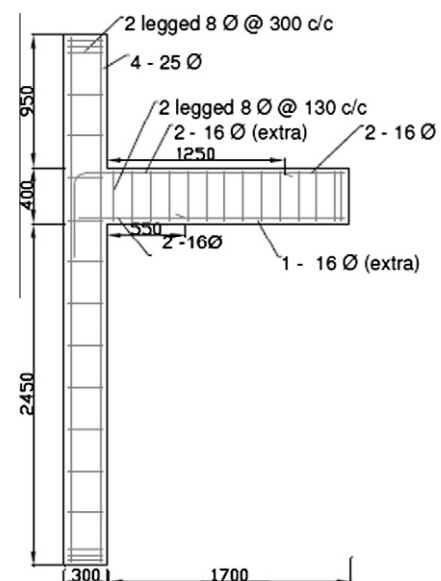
Geometric and reinforcement details of the gravity load designed specimen (SP-1).
